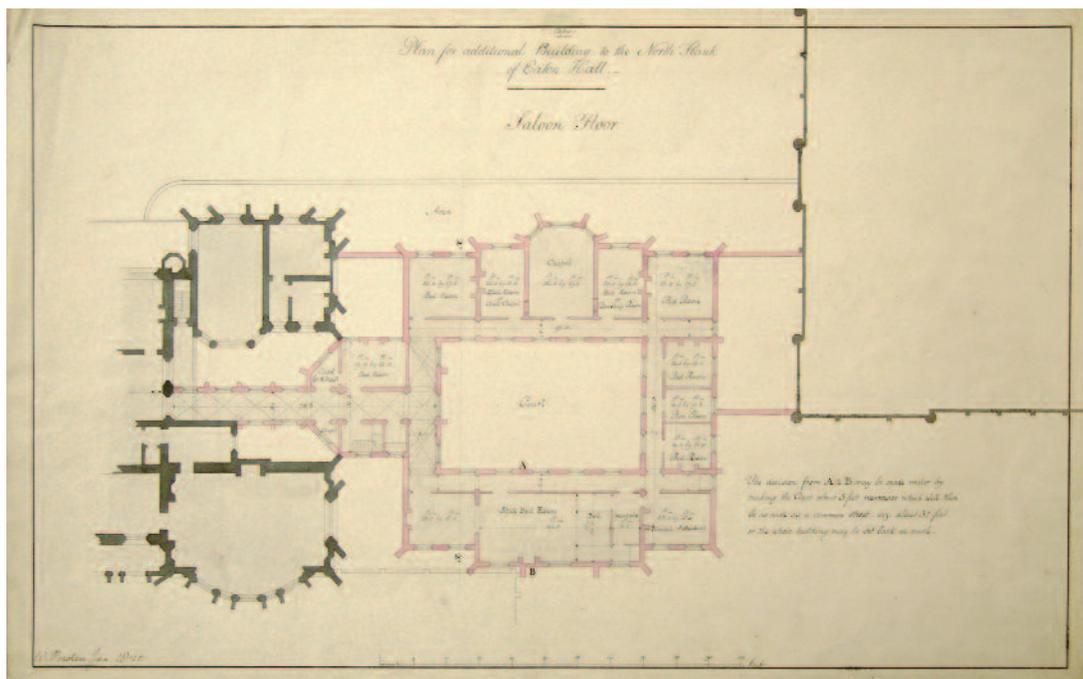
William Porden, Plan for additional building to the North Flank of Eaton Hall, 1820, ZCR 63/2/795.
